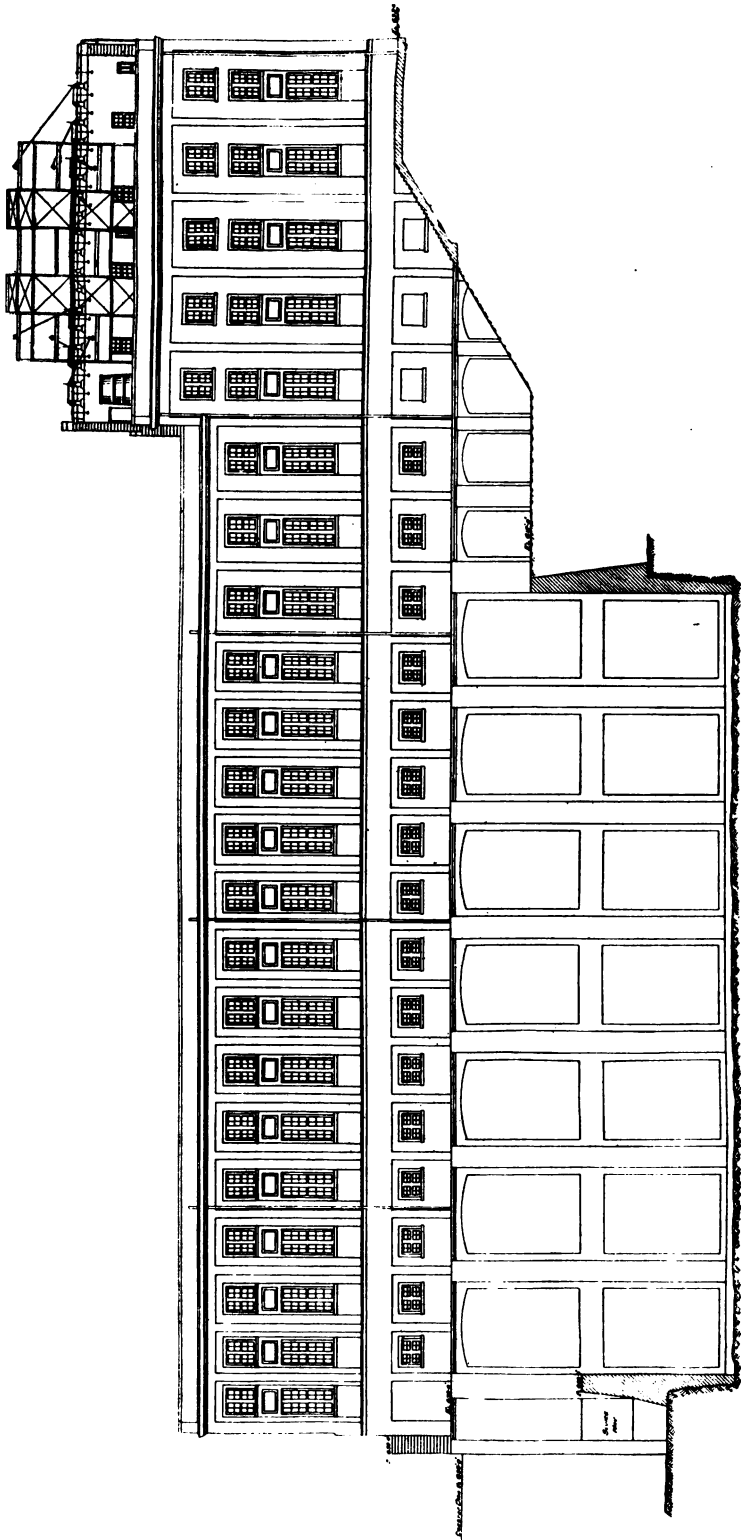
Down-Stream Elevation, Hales Bar Station, Chattanooga & Tennessee River Power Co.
